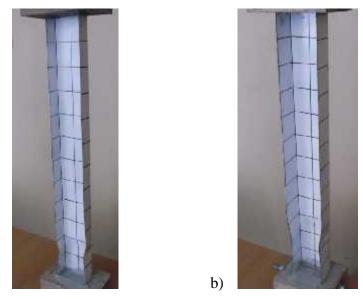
Collapse modes of test specimens a) UC 80-30 b) UC 80-50
